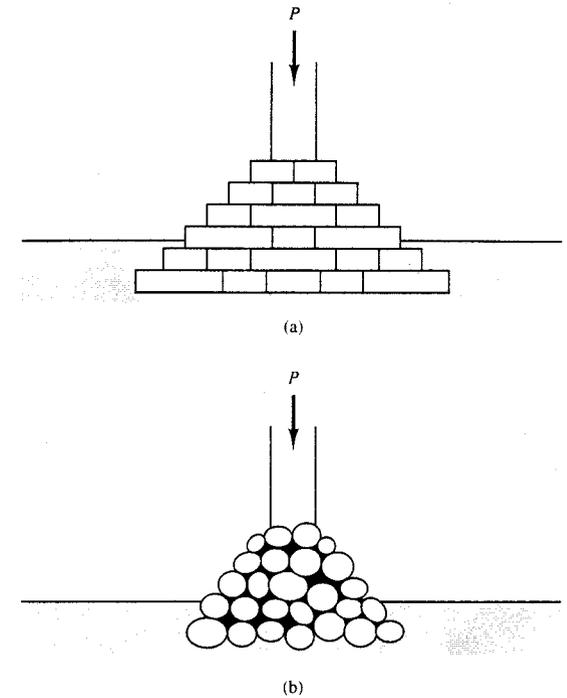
(a) Dimension-stone footing, and (b) Rubble-stone footing.
